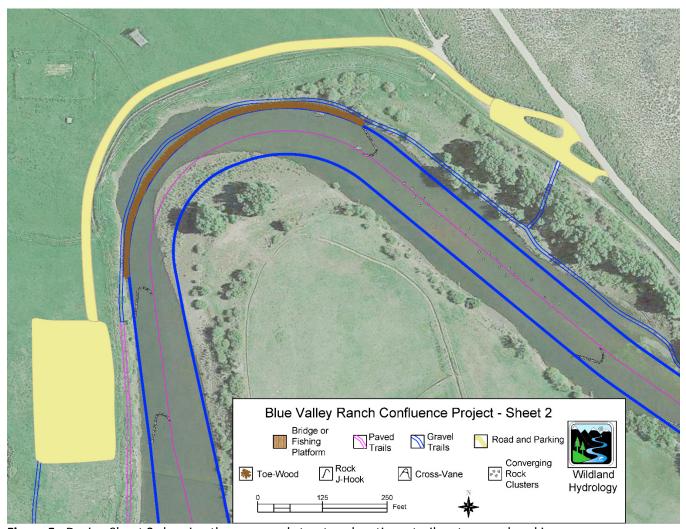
Design Sheet 2 showing the proposed structure locations, trail system, and parking area.
